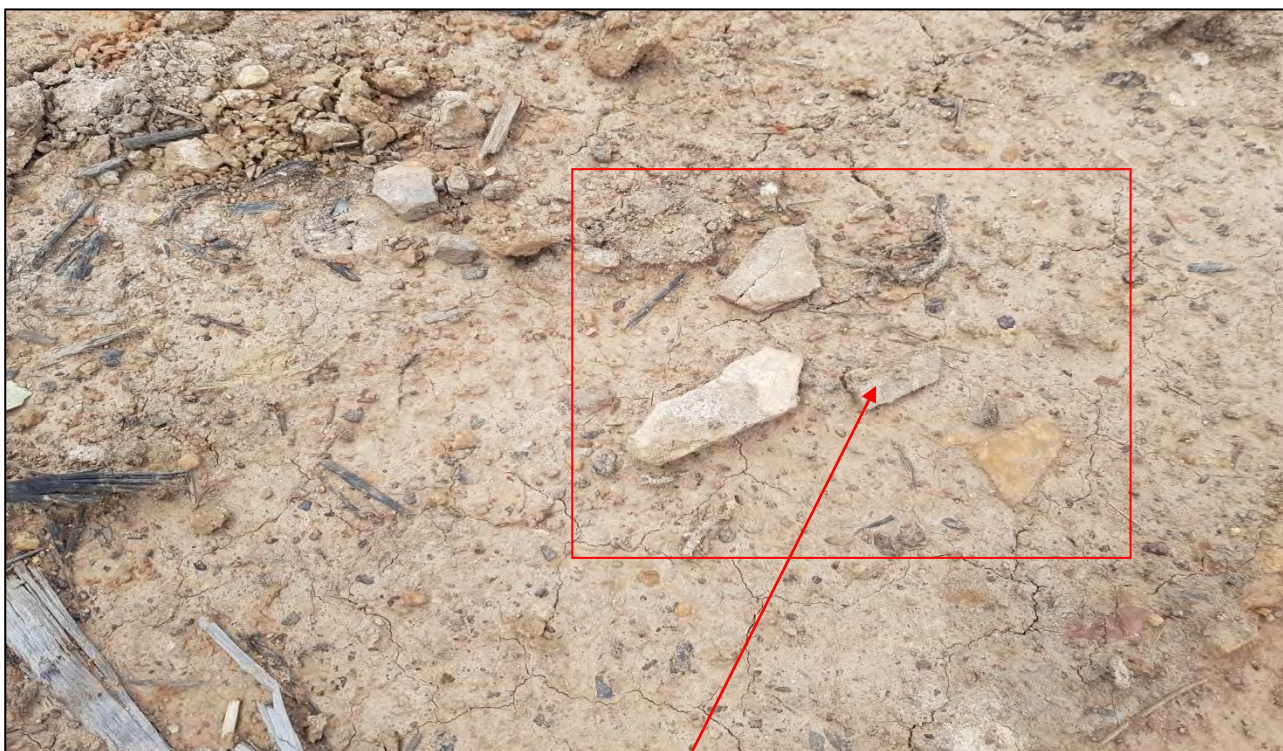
Un-lined concrete washout bay, as observed on 16.01.2018.
